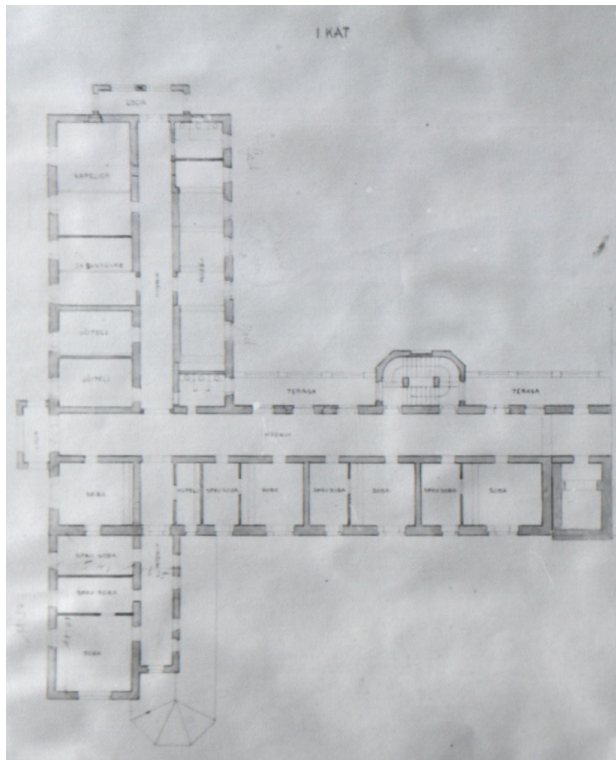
The Convent of Saint Luke the Evangelist, Jajce: floor plan of the 1st floor, segment of the first proposed project done by Karel Pařík (Dimitrijević 104.f)
